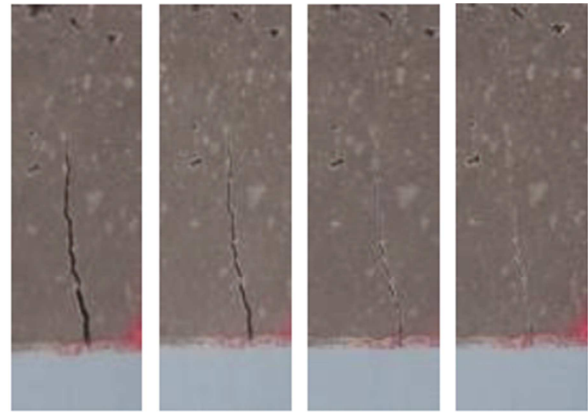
Crack closure of concrete beam made from pouring epoxy cements and mortars.
